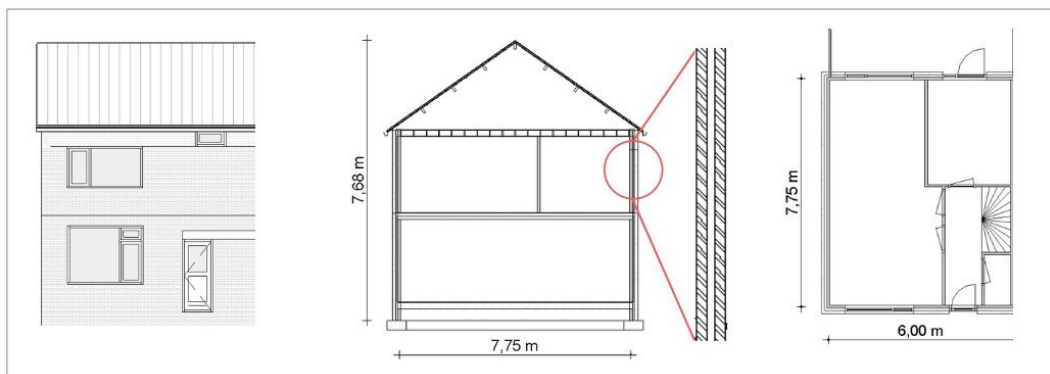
Existing terraced dwelling: south façade, section, façade structure and floor plan
